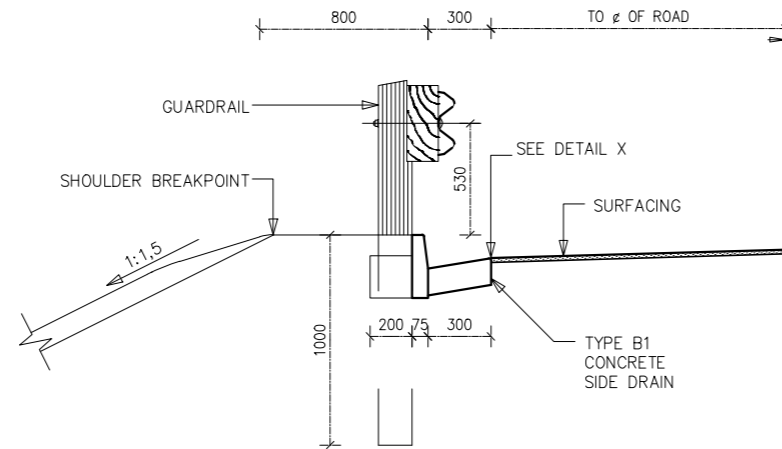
DETAIL OF TRANSITION AT TYPE 'f' CONCRETE SIDE DRAIN
